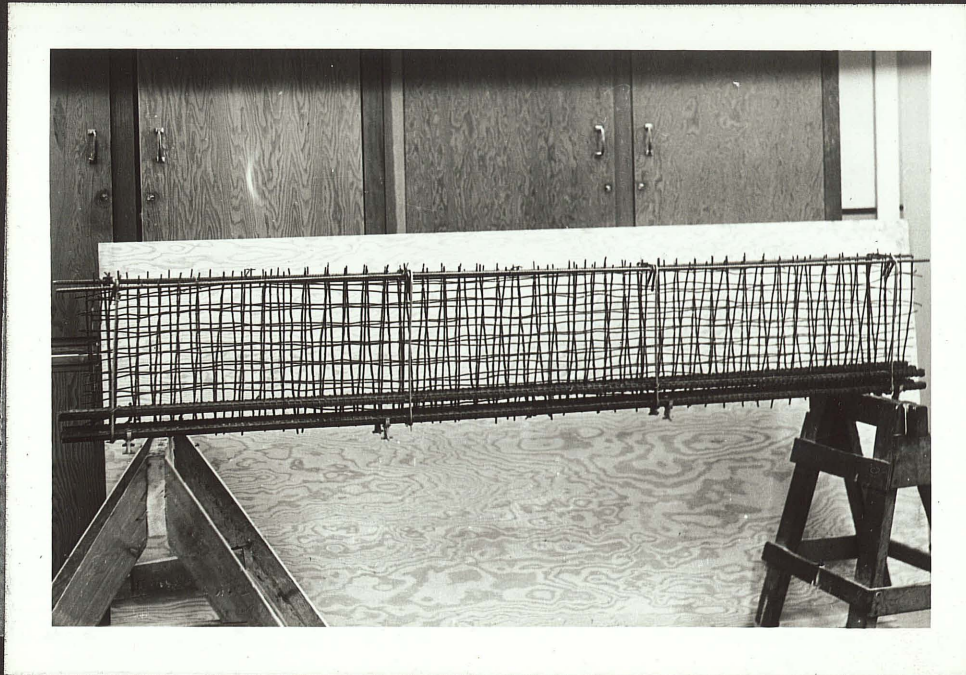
Reinforcement cage for Beam 6 (wire mesh)
